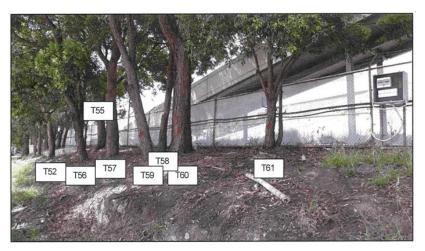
and 57-61 to be retained. Tree 56 is to be removed.
